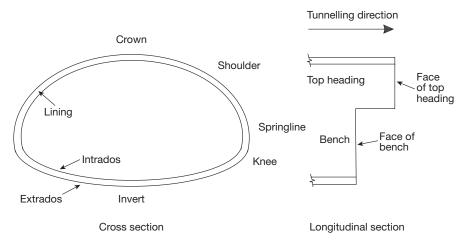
Terminology related to a tunnel cross section and longitudinal section
